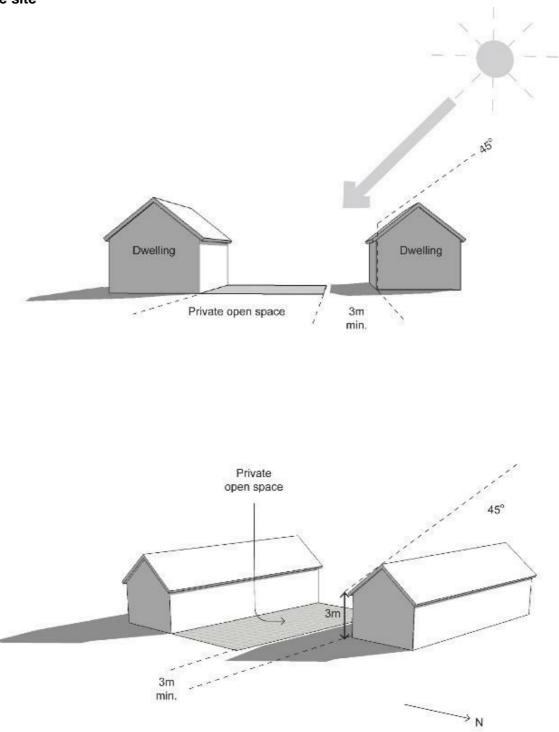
Separation from the private open space of another dwelling on the same site
